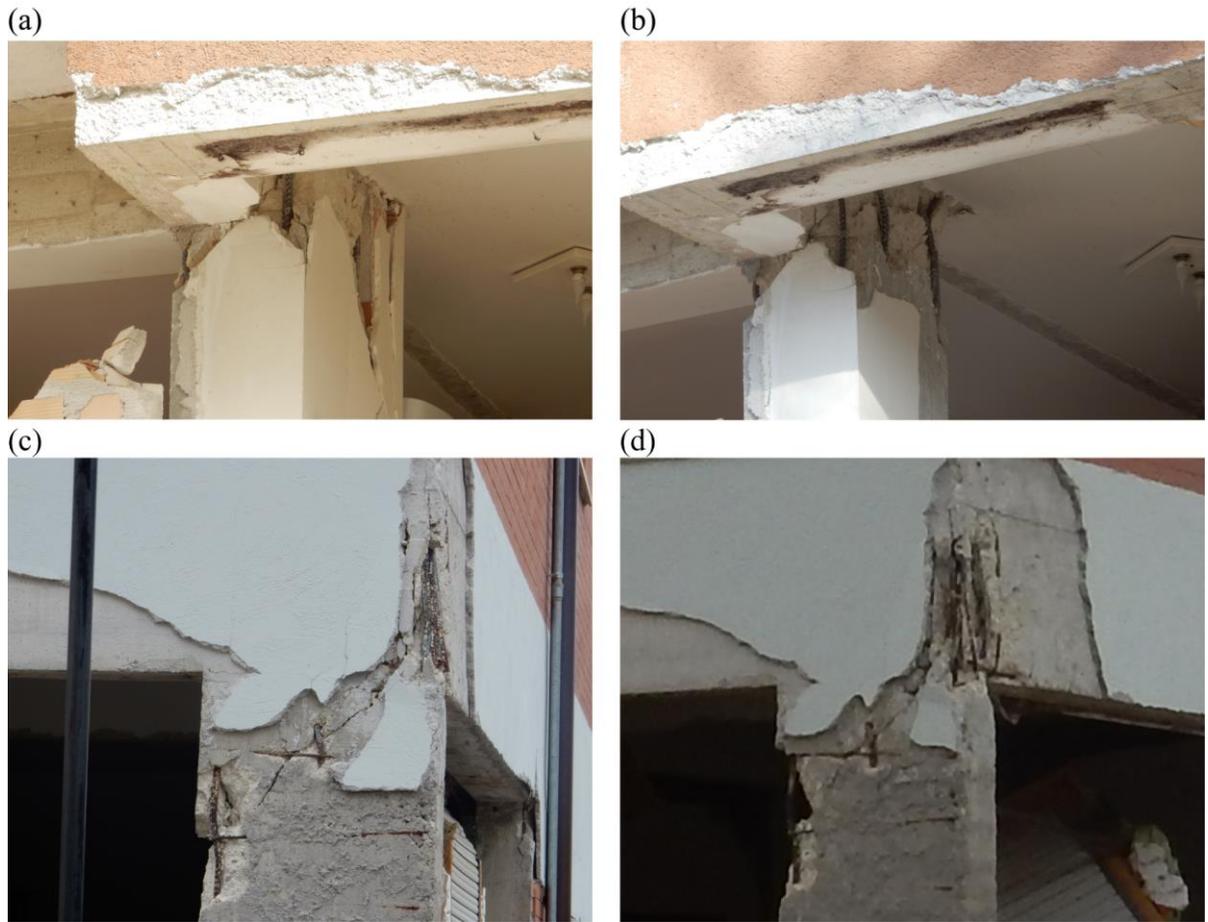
Beam-column joints. Concrete spalling and local bar buckling due to lack of transversal reinforcement after the 24 August event (a,c) and after the earthquake sequence (b,d).
